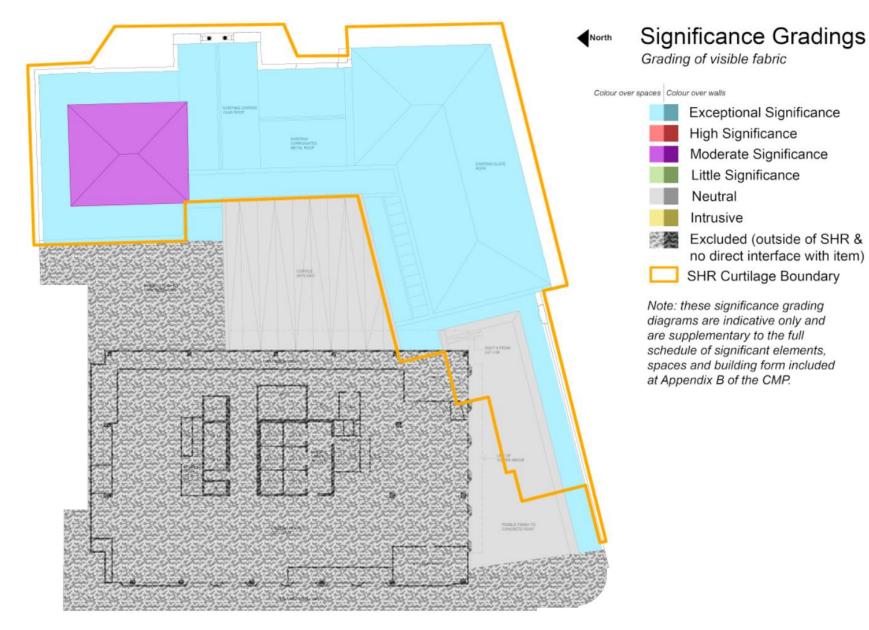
Grading Diagrams – Grading of Building Form and Spaces (Roof Plan)
